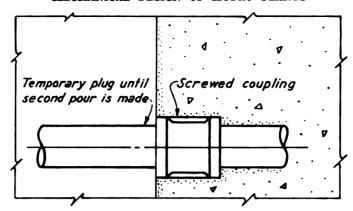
Typical screwed coupling for small pipeline emerging from concrete.
